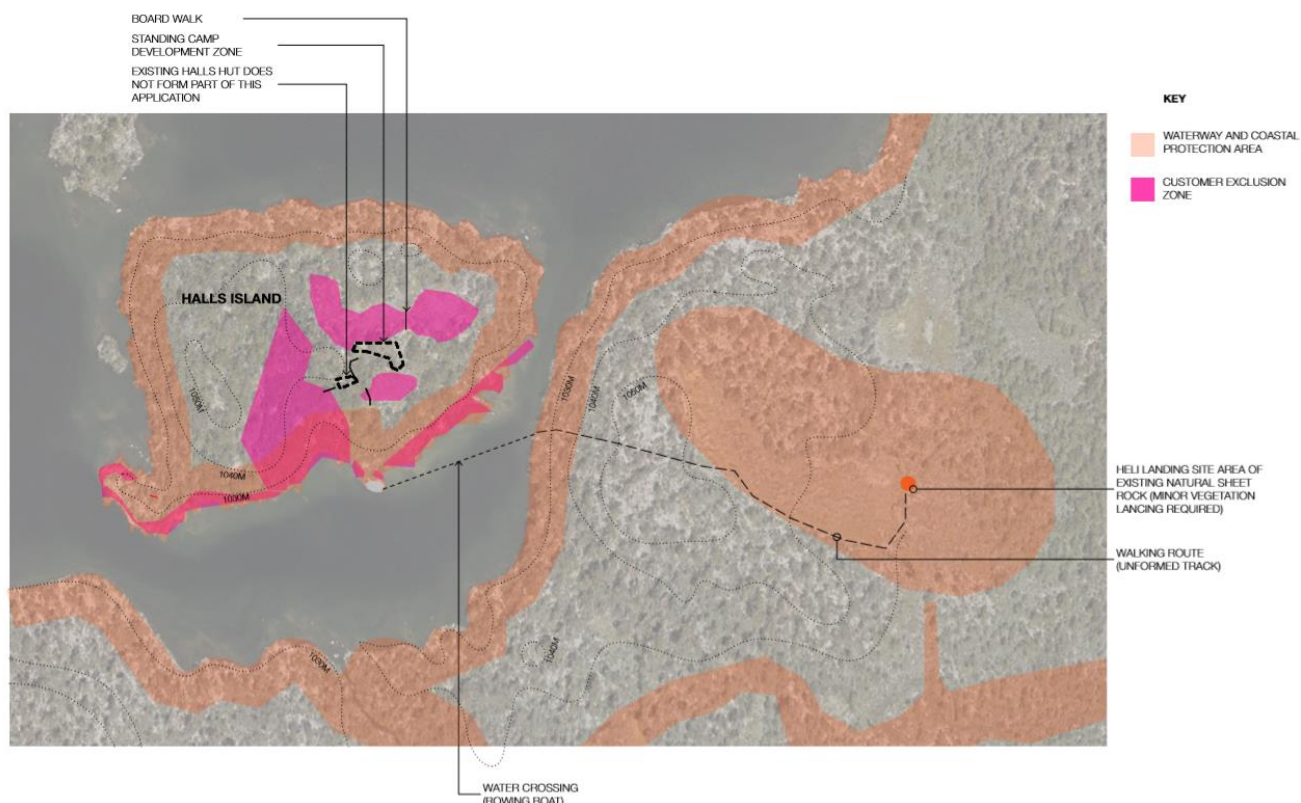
Proposal Plan (Source: Architectural drawing set, Cumulus Studio Pty Ltd).
